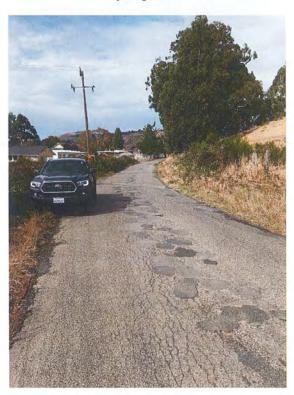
RP 2. Typical section of Chambers Rd (County maintained. State Road No.: FC010). Vehicle traveling east, photo taken facing west.
